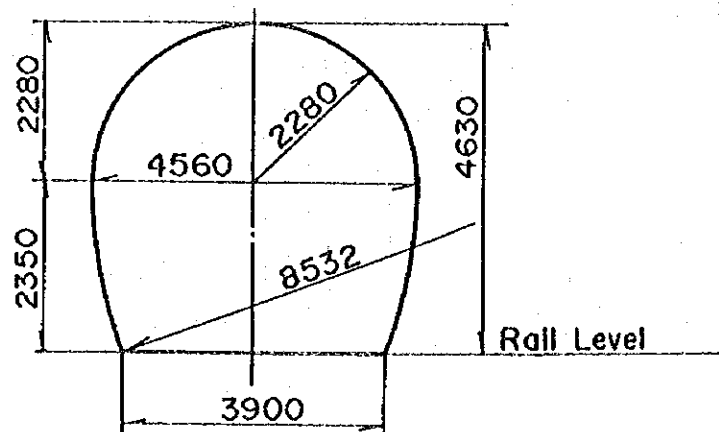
Tunnel Section in Japan (Non-Electrified Section)
